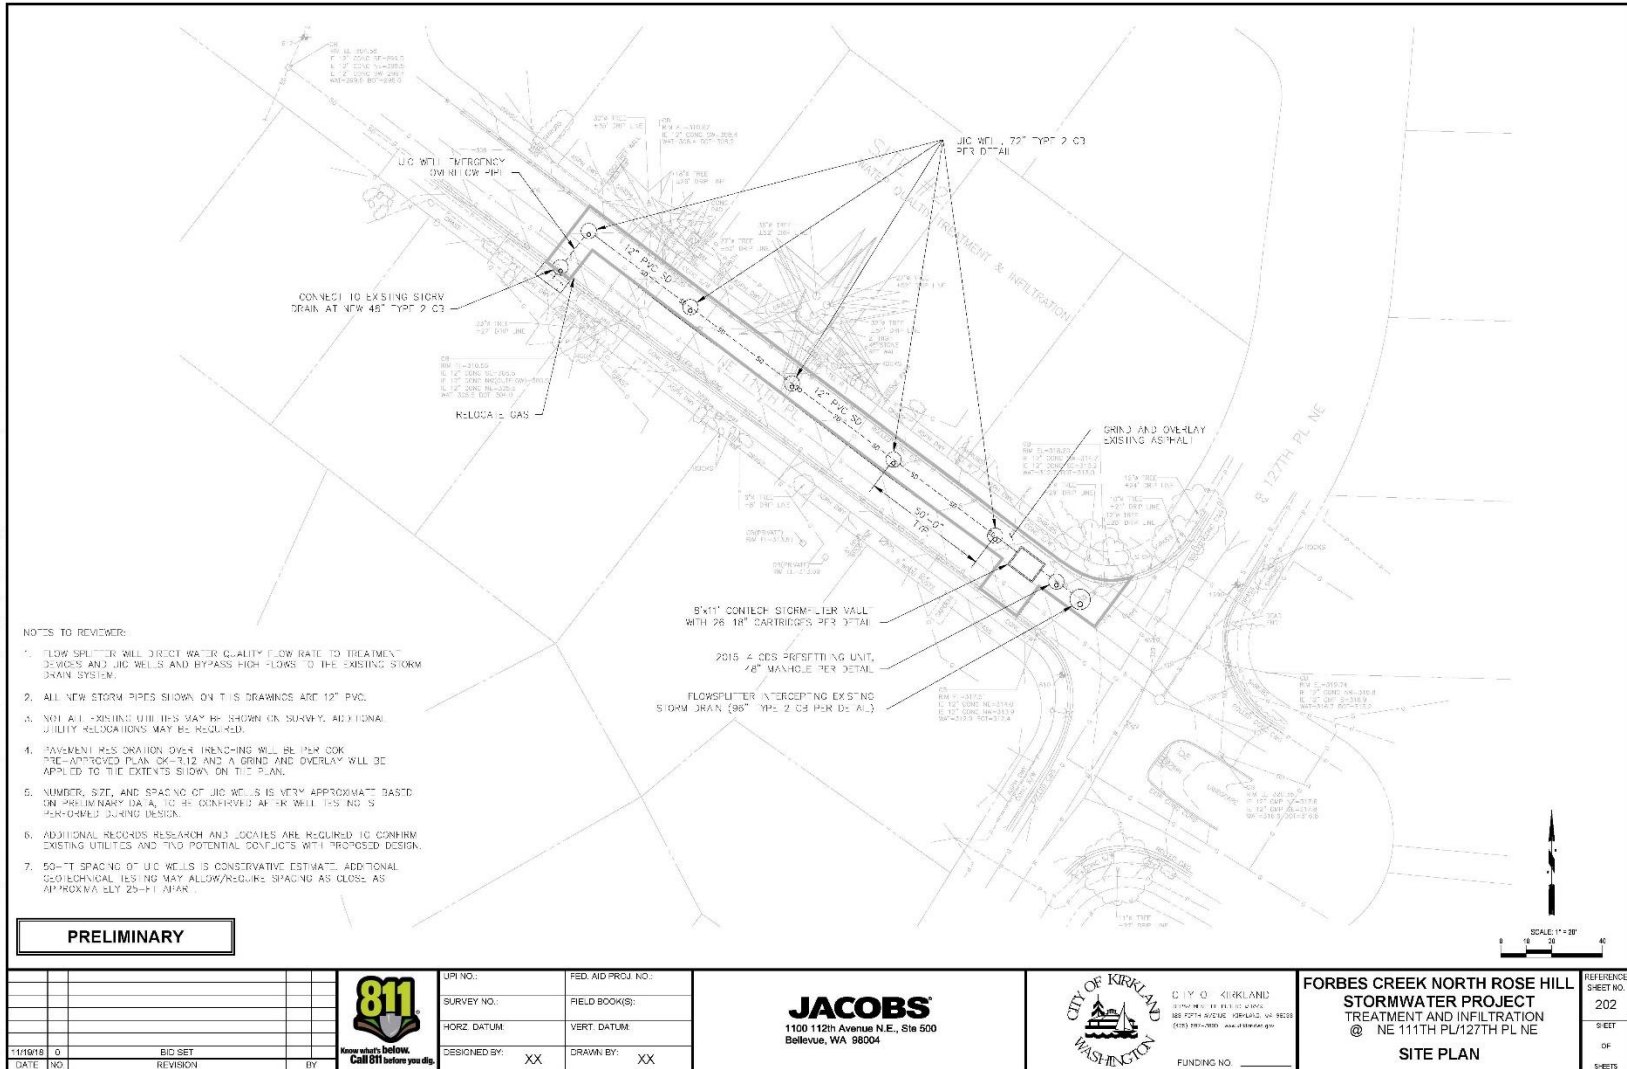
Preliminary Site Plan for Site 2 - Forbes/North Rose Hill Stormwater Retrofit
